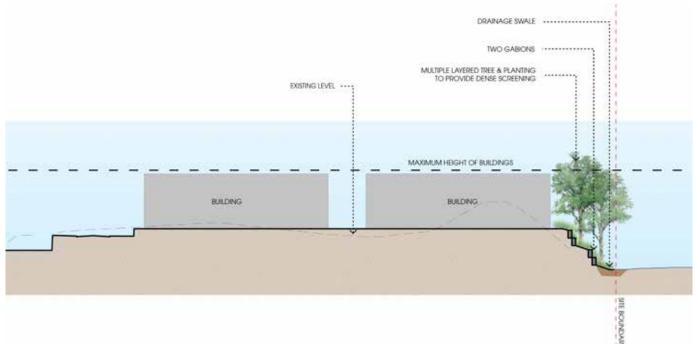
SECTION, LANDSCAPE BUFFER ZONE WITH 10M HIGH BUILDINGS
